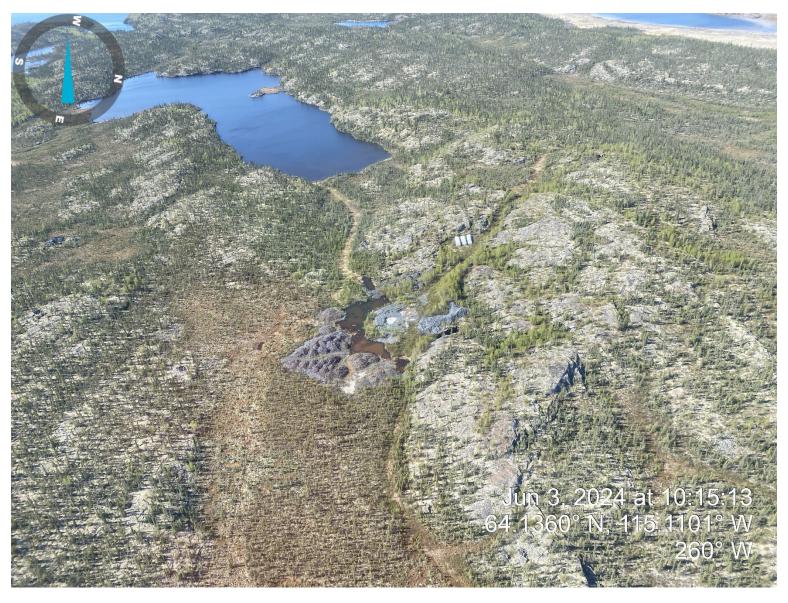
SNP 5-13, Pool of Standing Water in Rock Pile Area. Photo Orientation: South.
